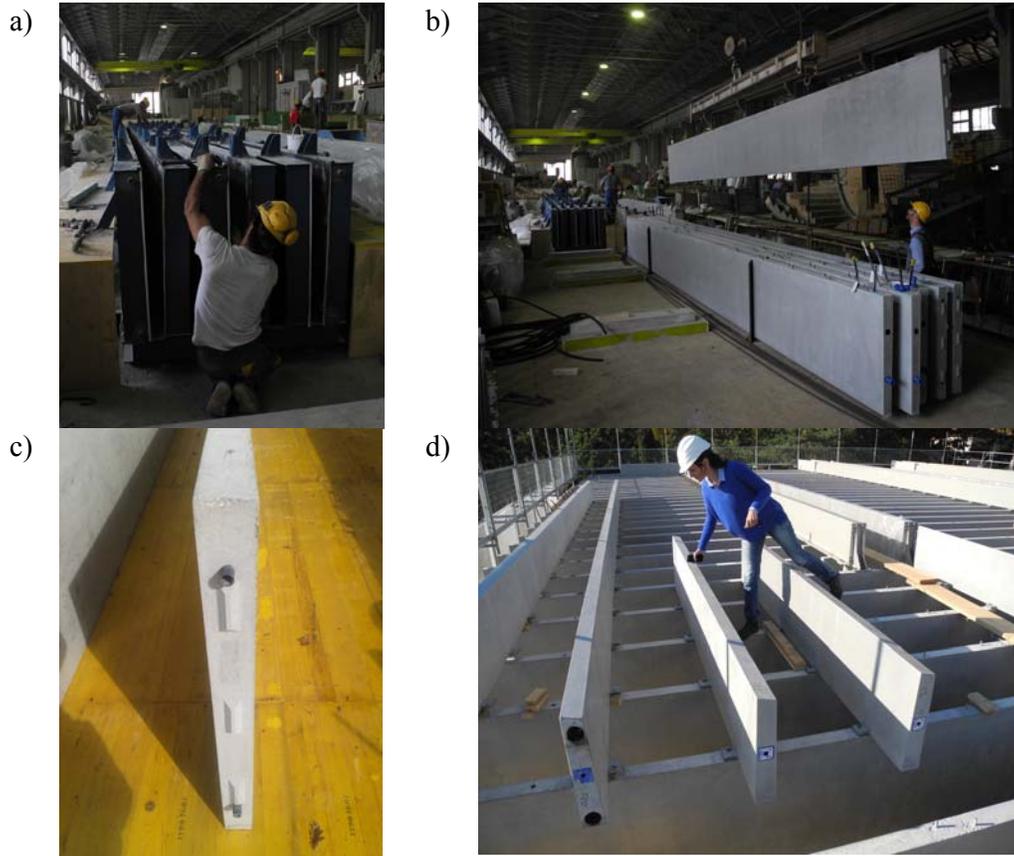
a) arrangement of steel formwork, b) handling of the 10.50 m elements, c) match-casted joint for the 21 meter beams and d) erection of longitudinal stiffeners over the transversal beams
